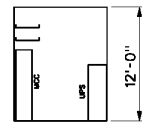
Mechanical (Forced) Draft Dry/Air Cooling—Main Switchgear Electrical Building
